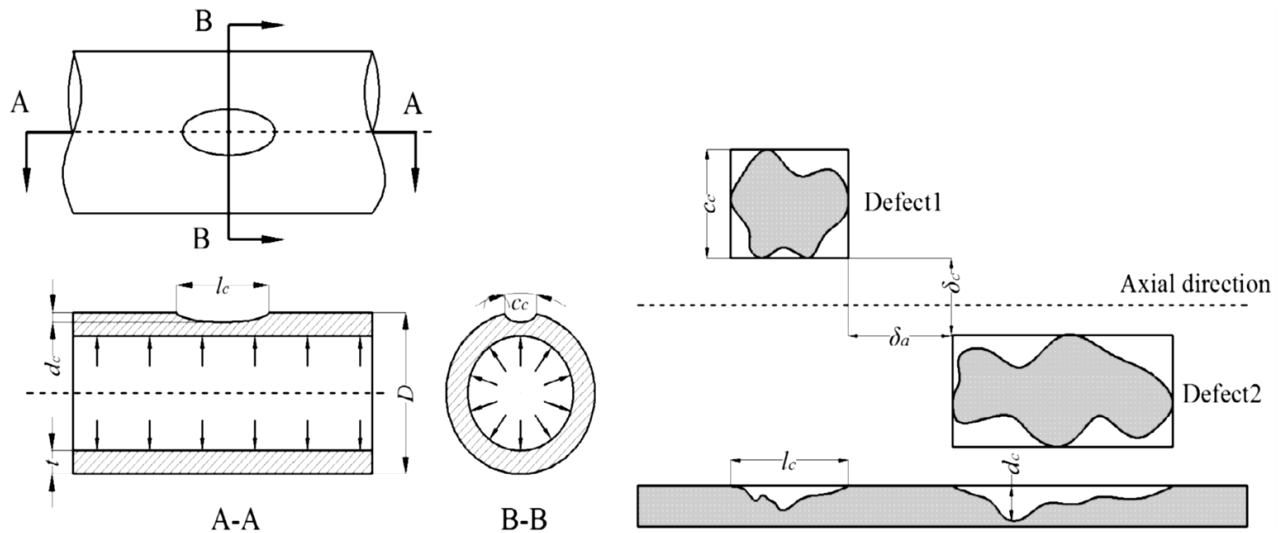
Schematic of the numerical model with corrosion defects [42].
